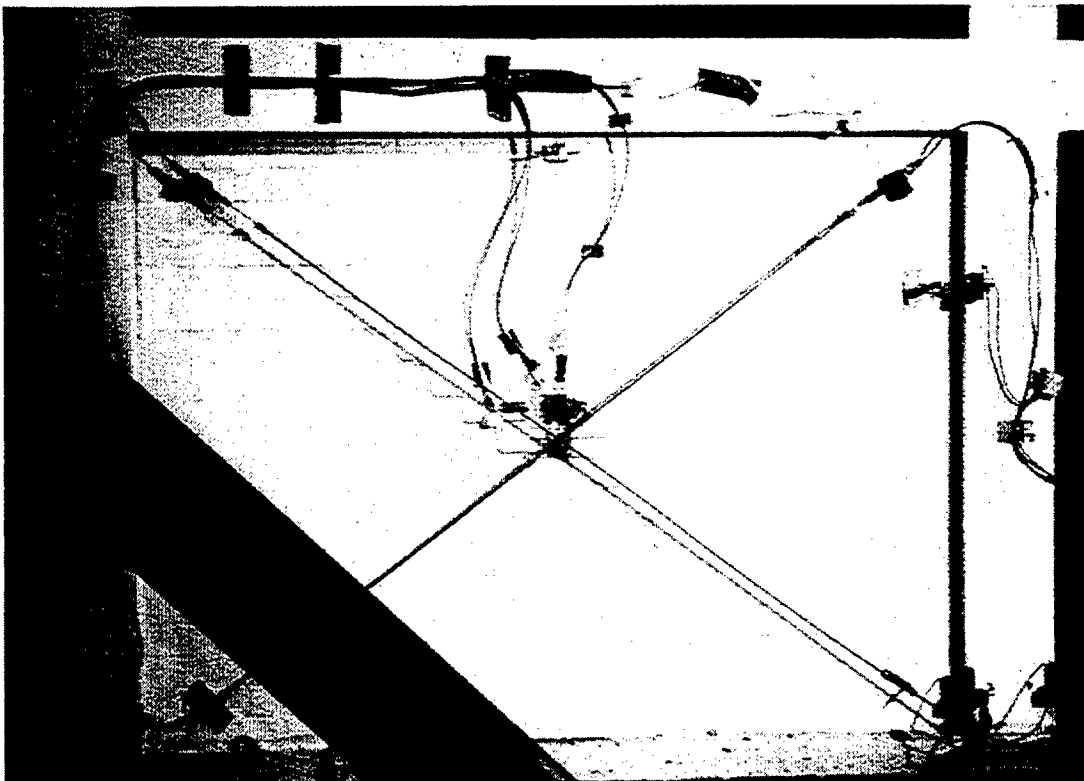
Model 3, Single-Bay Brick-Infilled Specimen, Formation of the First Diagonal Crack in the Infill
